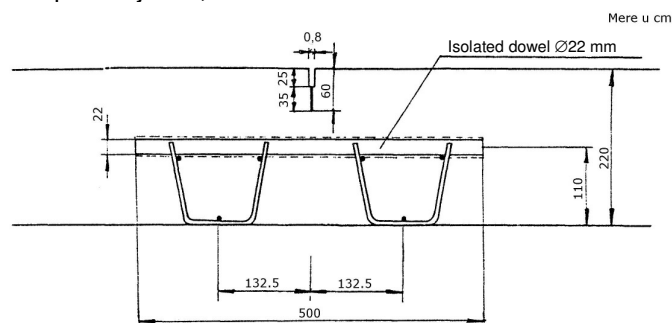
Transverse dummy joint in the cement concrete surfacing
